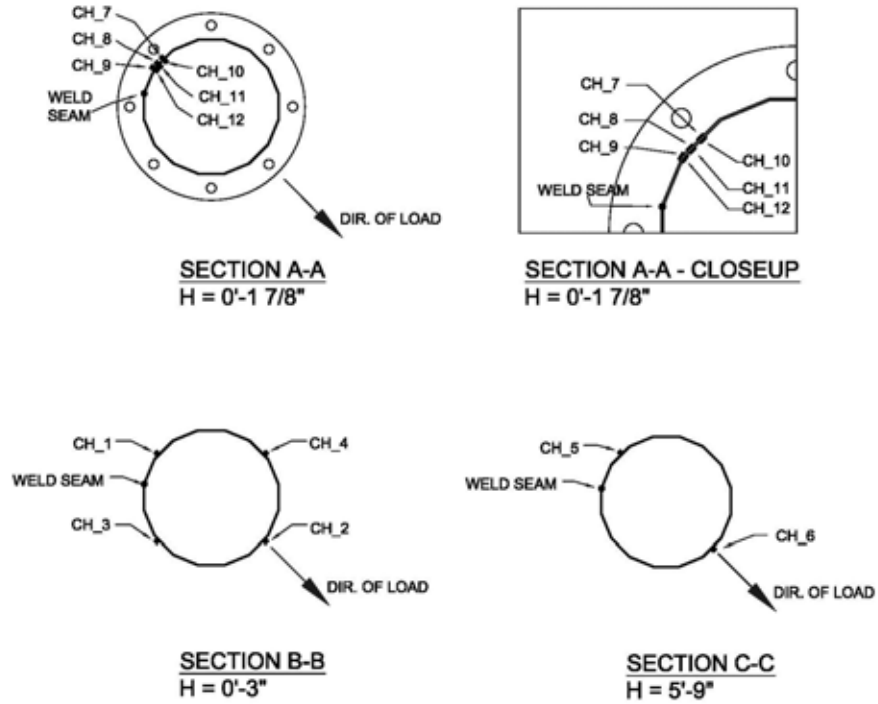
Strain gage details for the As-built tower along I-29 in Sioux City, Iowa
